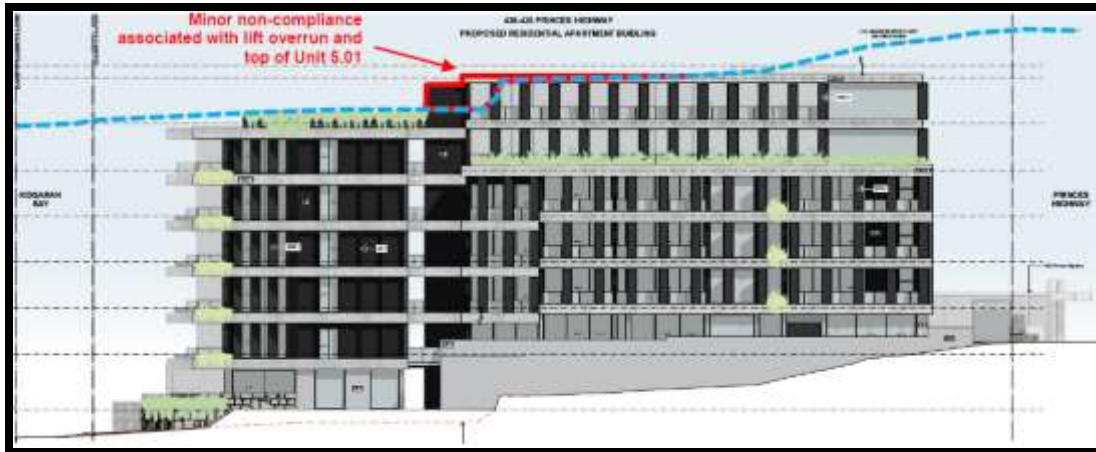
Elevation showing height non-compliance (Source: SEE by Planning Ingenuity)
